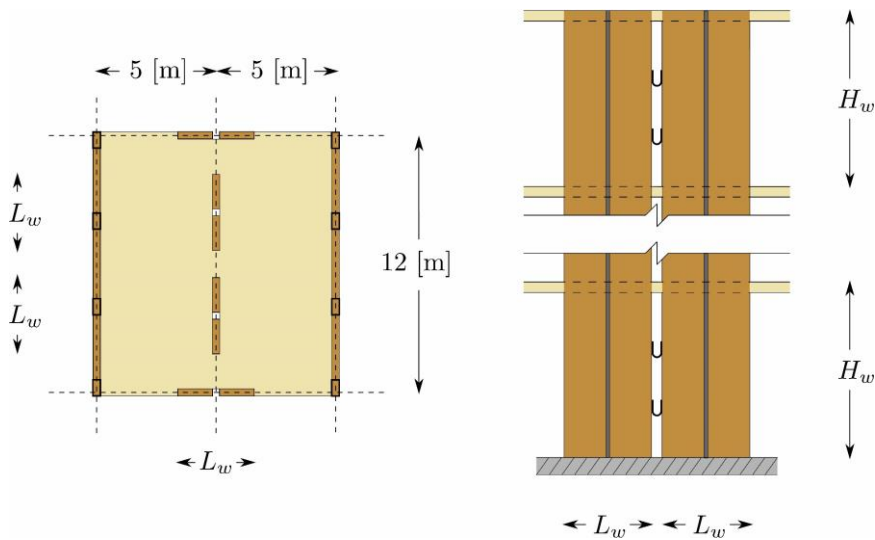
Plan and elevation view of the structural system considered (Thiers-Moggia and Málaga-Chuquitaype, 2018).
